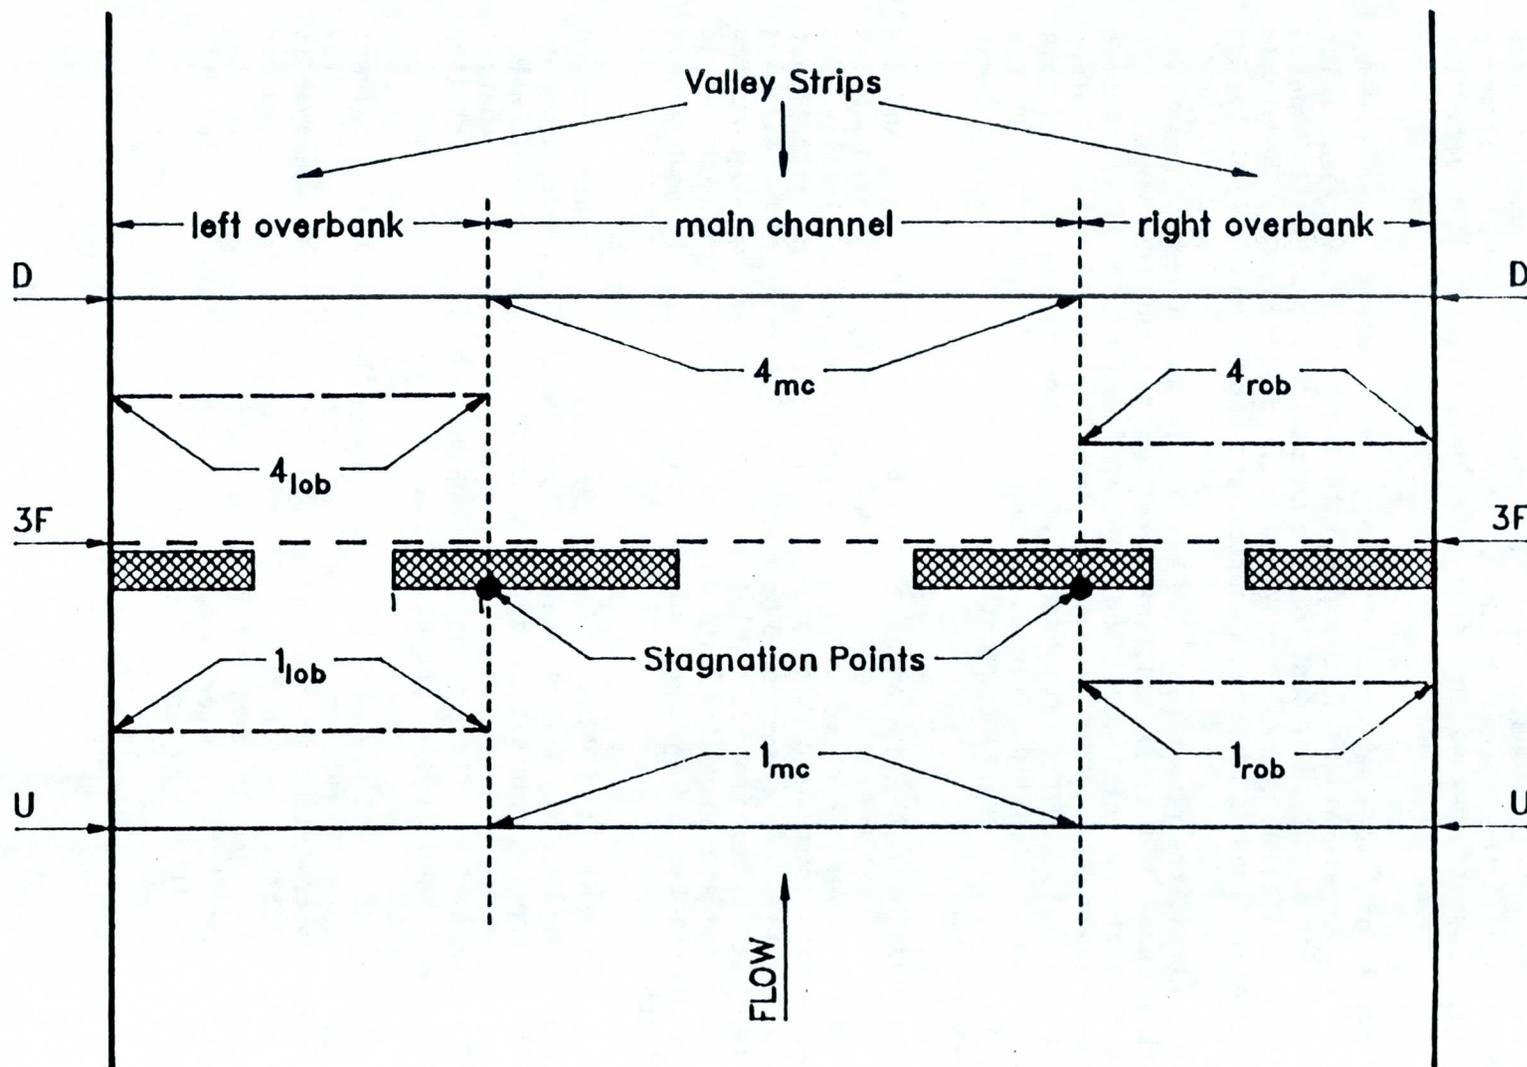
Sketch of typical multiple bridge opening situation illustrating valley strips and cross-section locations
